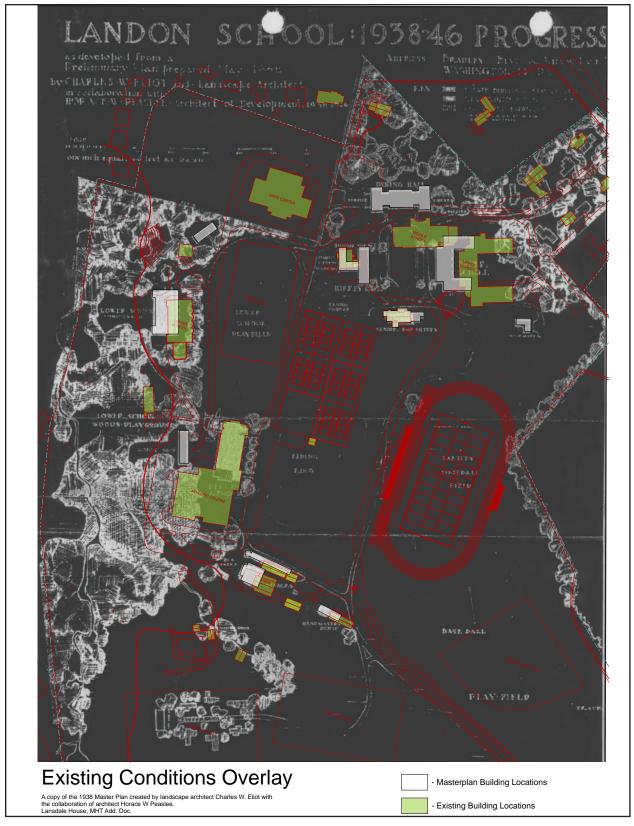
Existing conditions and preliminary campus plan overlay. cgs architects.
